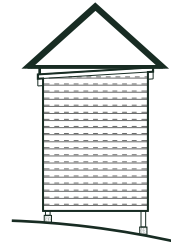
Foundation options, pillars, wires and grounded with rocks.
